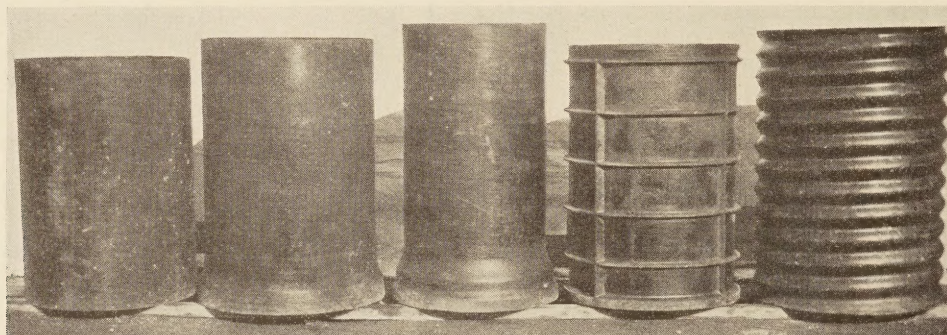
REPRESENTATIVE SPECIMENS OF TYPES OF PIPE TESTED. SPECIMENS ARE (LEFT TO RIGHT) SMOOTH SAND-CAST PIPE, PLAIN END; SMOOTH SAND-CAST PIPE, BELL END; SMOOTH CENTRIFUGALLY CAST PIPE, BELL END; RIBBED PIPE; SPIRAL-CORRUGATED PIPE.
